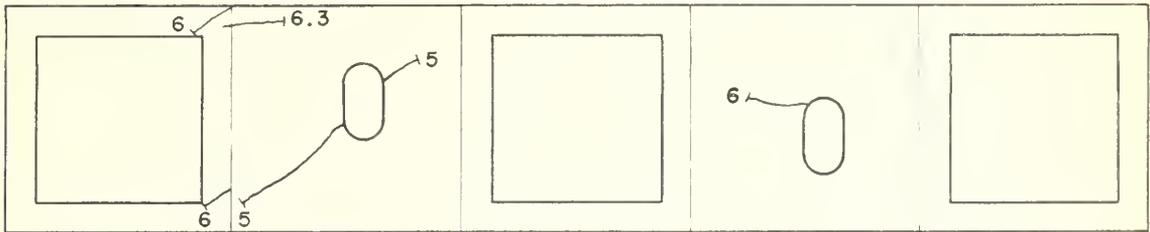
CRACK PATTERN IN BEAMS NO. 15 & 16
